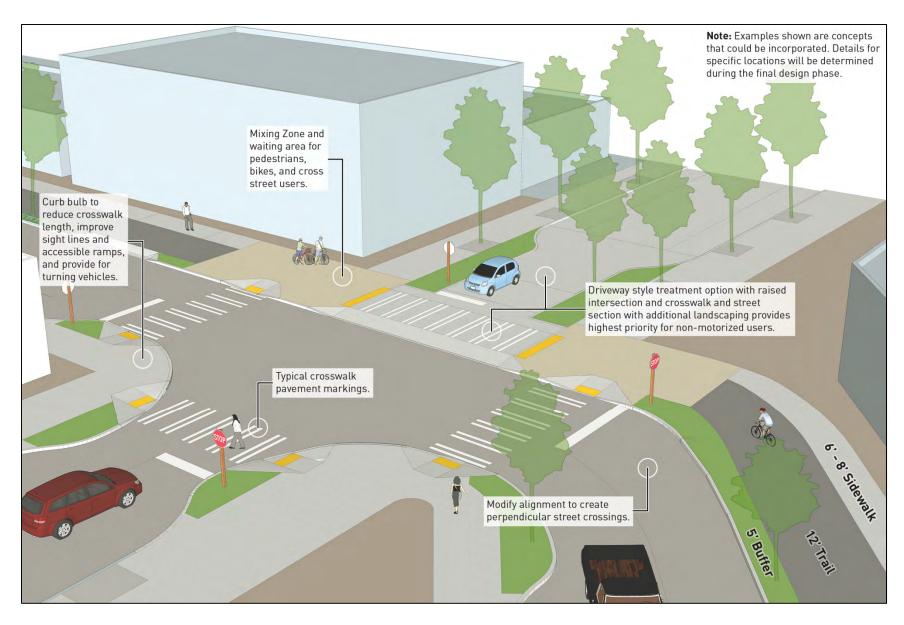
Intersection Design Options: Driveway Style Intersection
